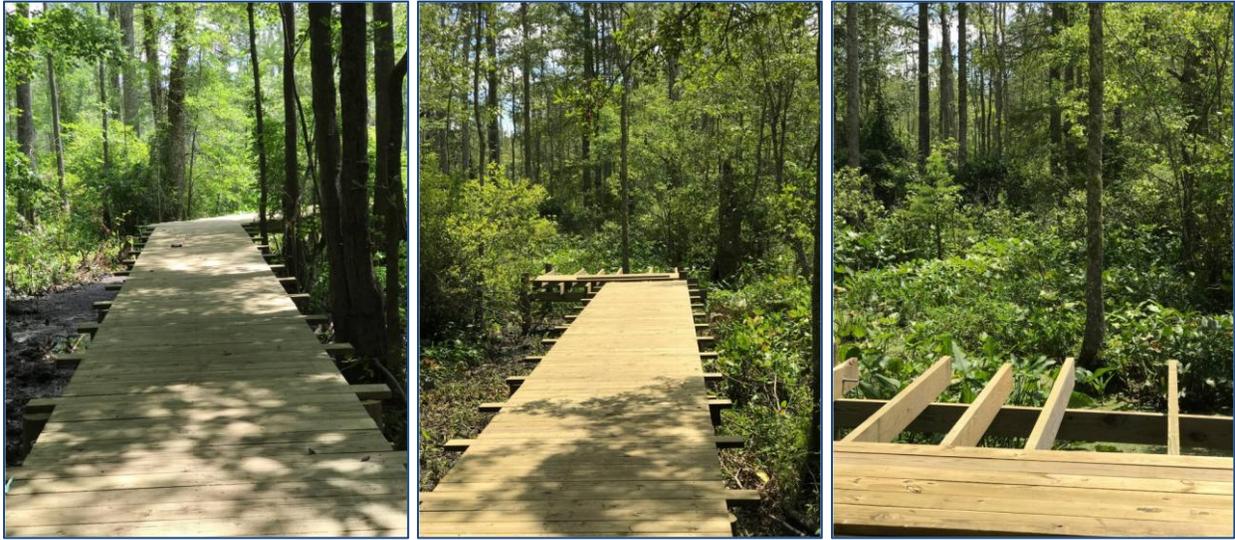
Viewing platform 2 under construction (Photo taken: August 7, 2017).
